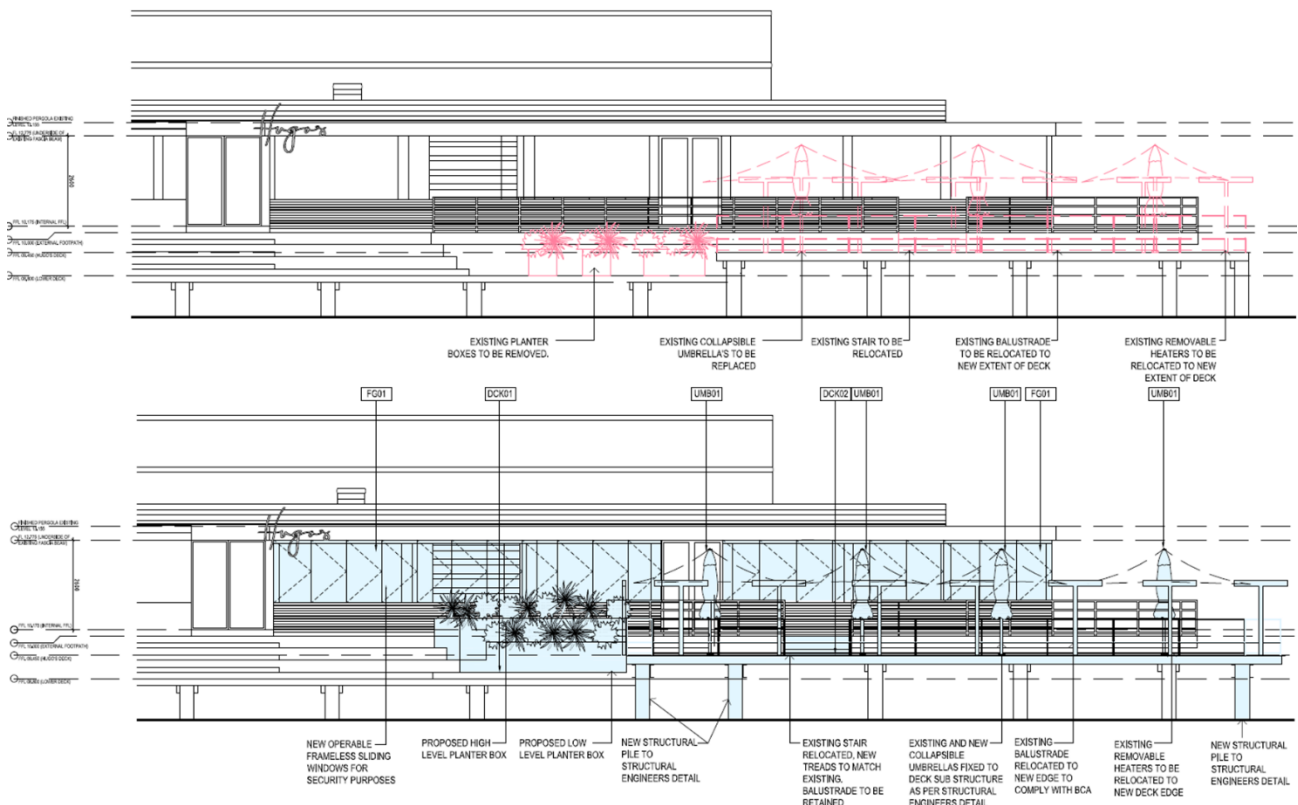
Western elevation (existing above compared to proposed elevation below)
